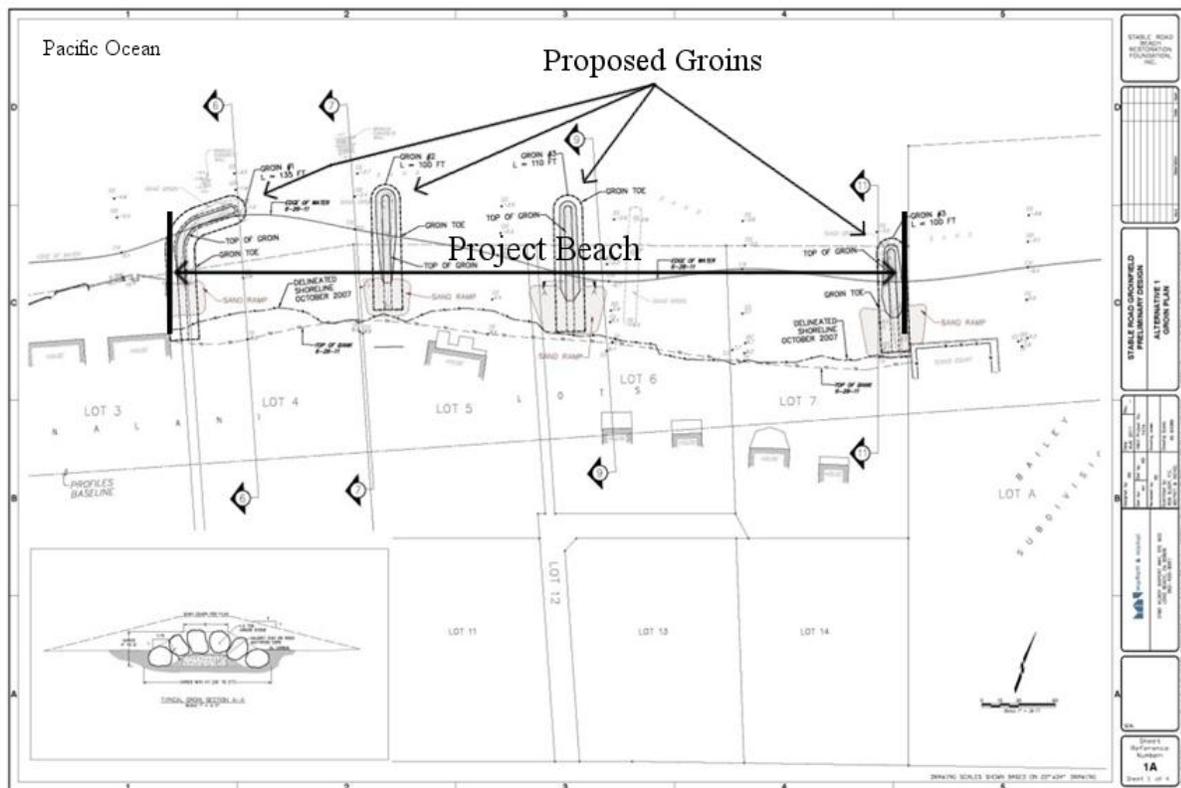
Proposed Action Site Plan and Replacement Groin Cross Section - 4 Groin Plan
